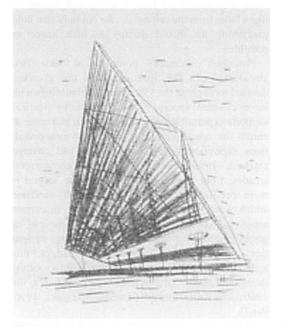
Officine Meccaniche Pavilion at the 26th Milano Trade Fair (R. Zavanella 1948): Sketch (Domus 229: 7)
